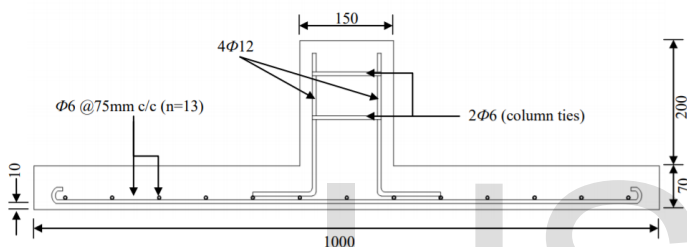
Elevation View of Reinforcement Details of test specimens, oukaili and Salman [1]
